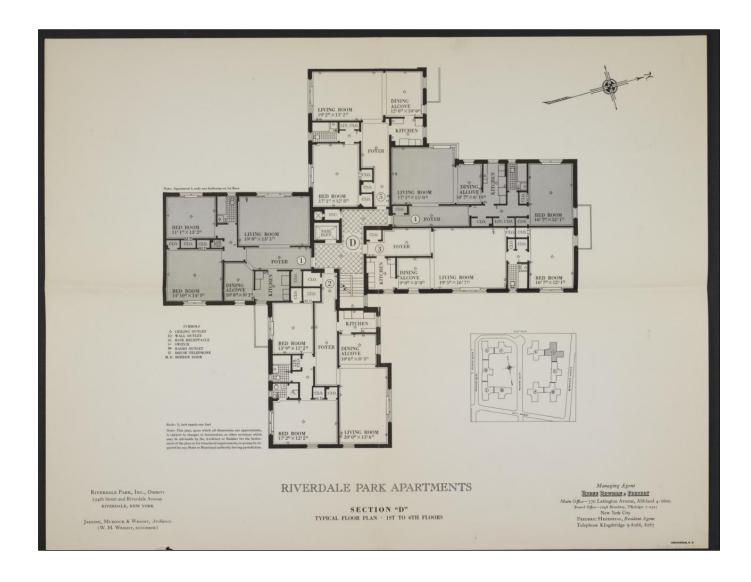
Typical floorplans in Section D of the Riverdale Park Apartments (Jardine Murdock & Wright 1939).
